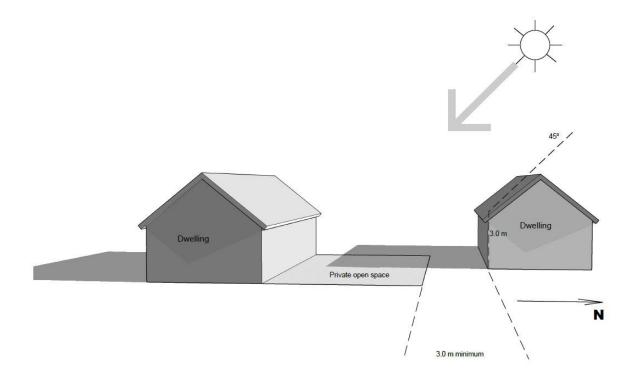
Separation from the private open space of another dwelling on the same site as required by clause 11.4.4 A1(a)
